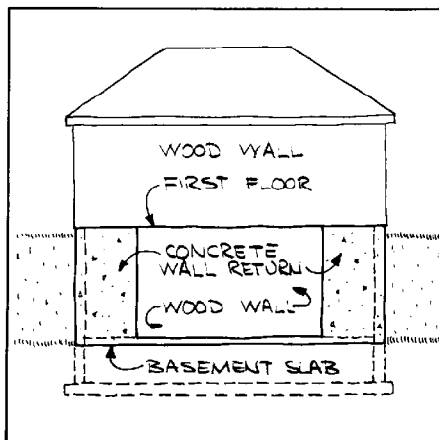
The downhill side of a sloped foundation need not be concrete since there's little or no unbalanced soil pressure. A wood-framed wall will do the job—with a concrete return at both ends.
